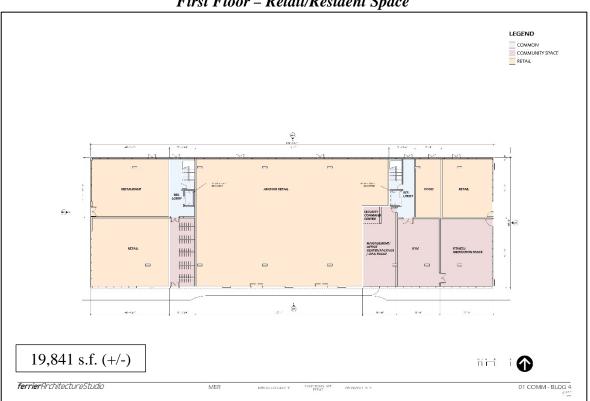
D - Floor Plan-Building 4 First Floor – Retail/Resident Space
